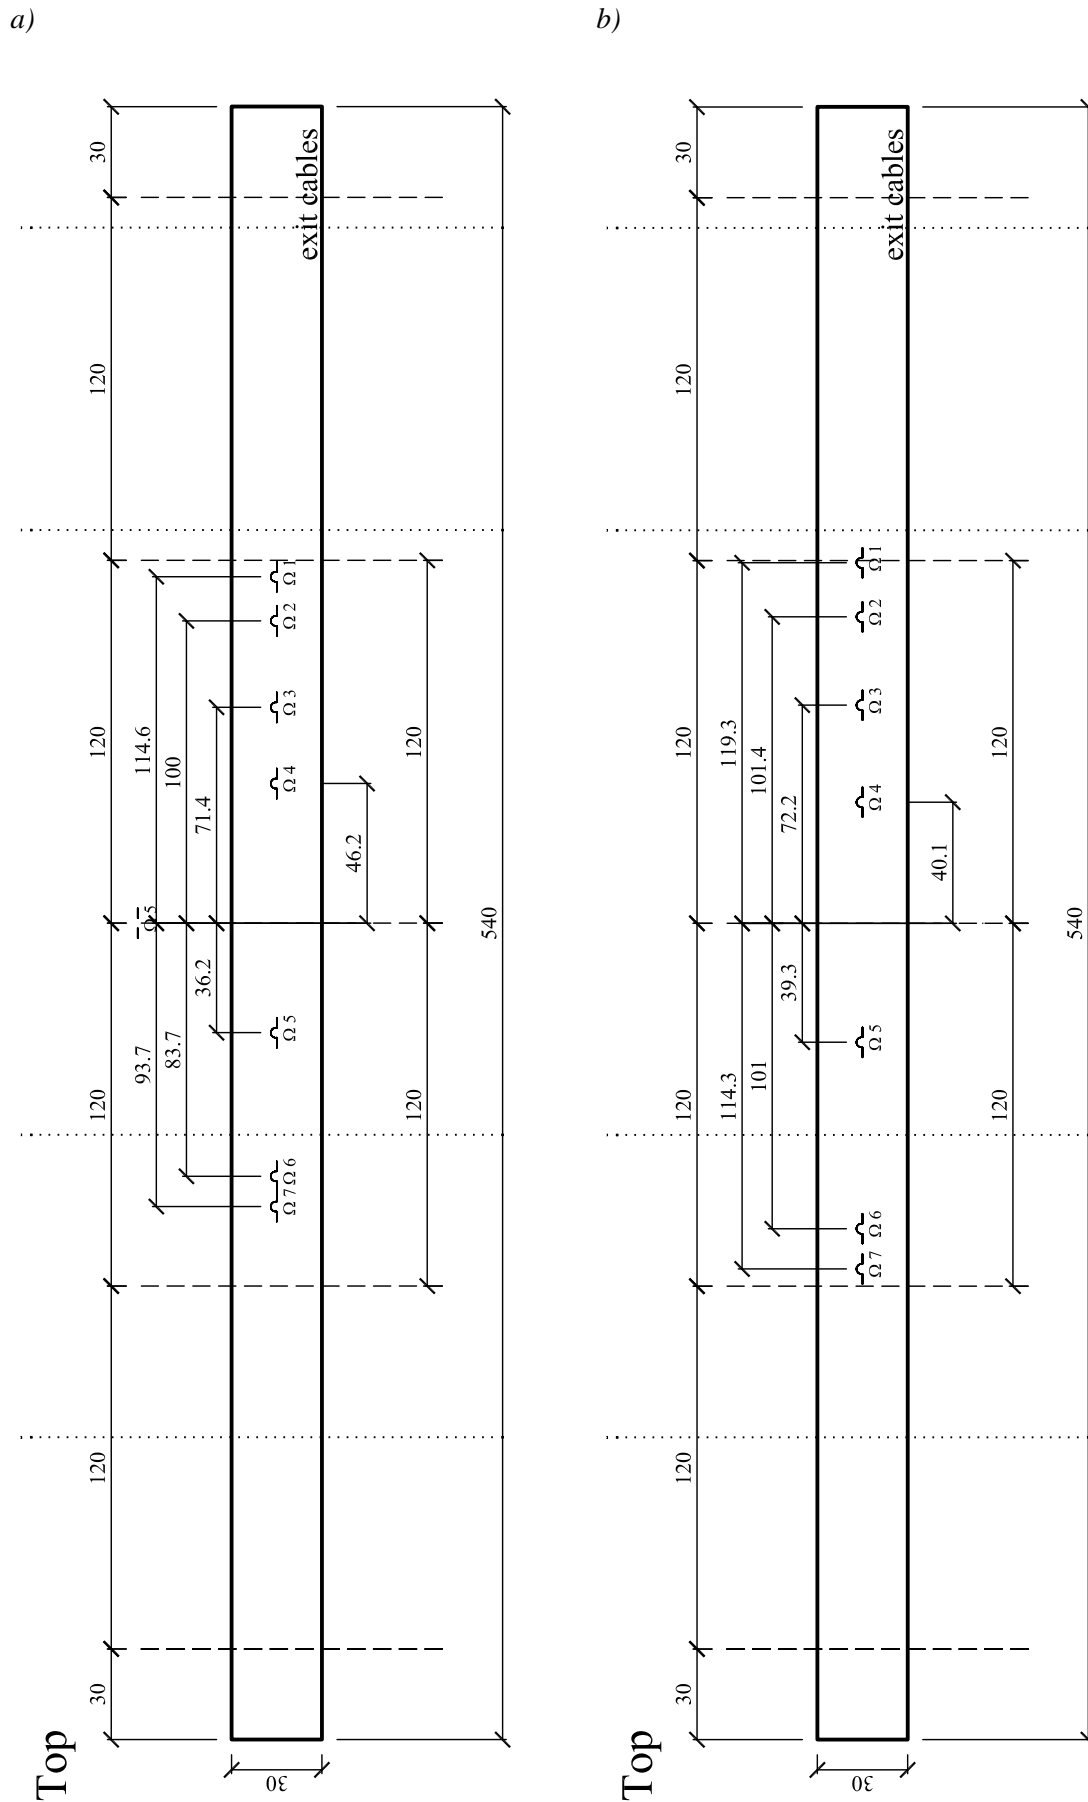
Position of the Ω -gages during the fracture test: a) H5, b) H5R
